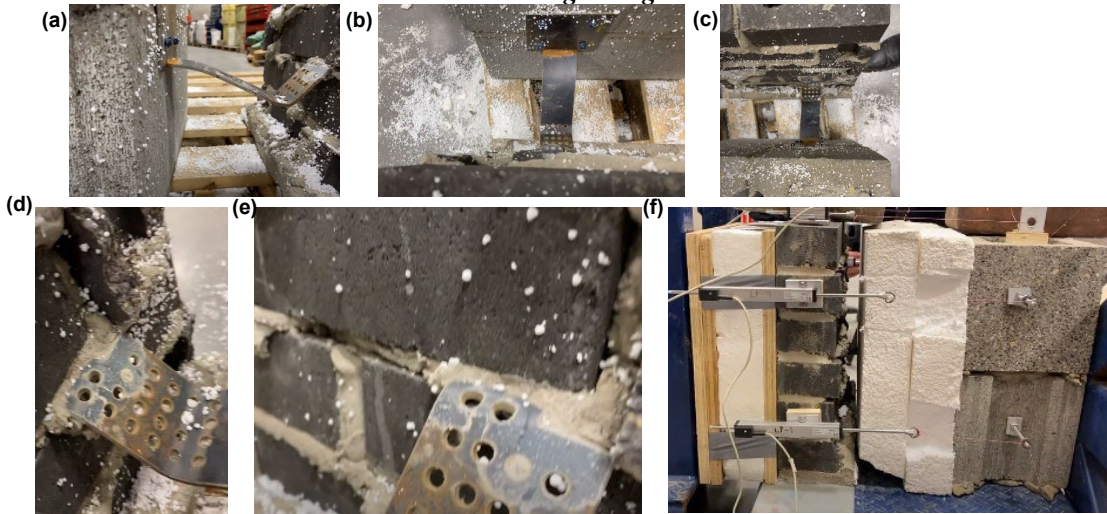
C-PH.CN-2 after testing of (a) side view, (b) top view, (c) alternative top view, (d) clay brick veneer connector interface, (e) horizontal mortar joint condition, (f) specimen view during testing
